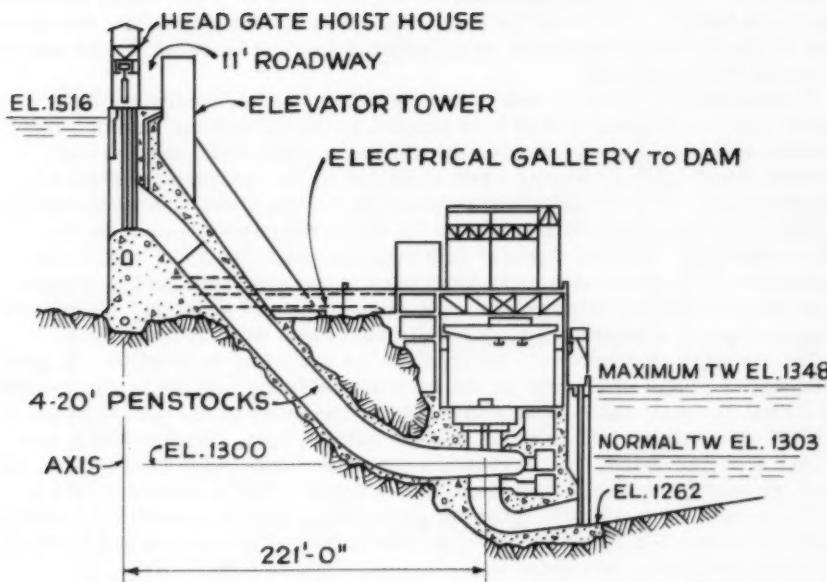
SECTION AT INTAKE AND POWER HOUSE
